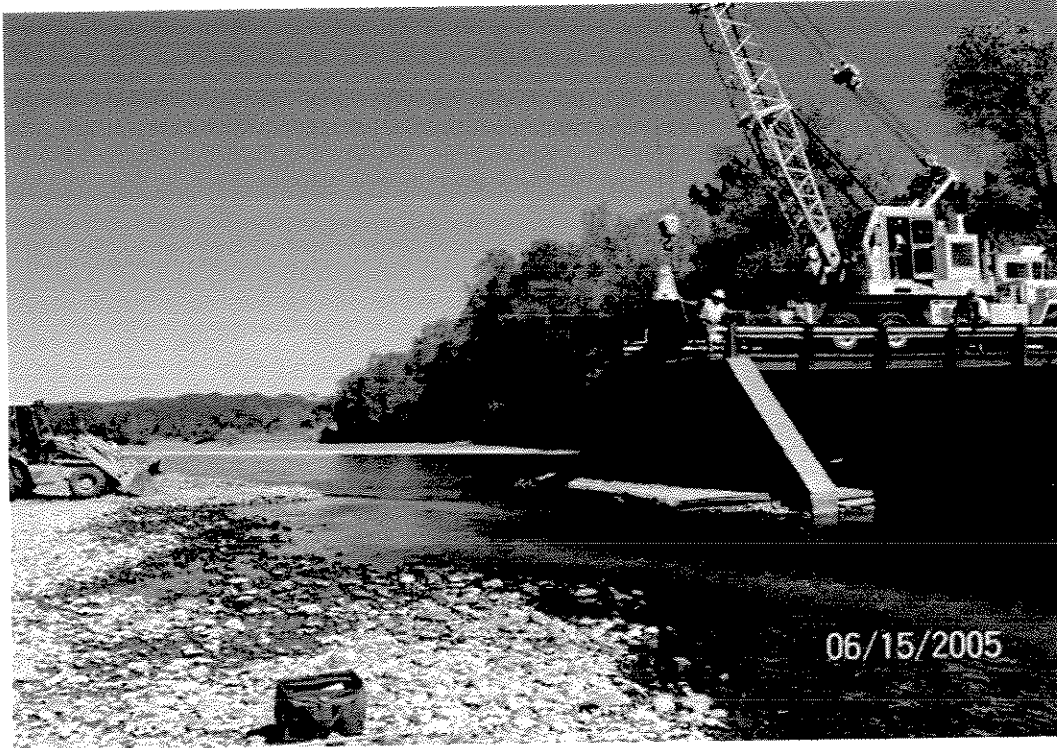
Washington School Road at Asti Russian River Summer Crossing Placing the Temporary Bridge Decks.
